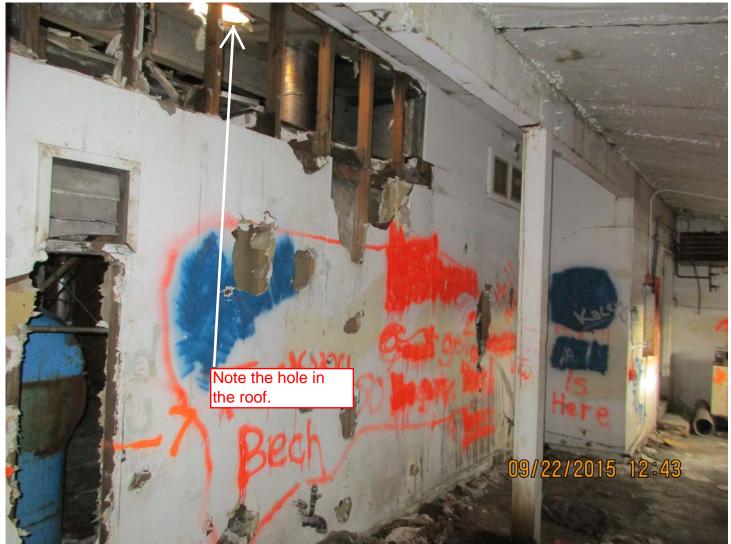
The wall separating the laundry room and mechanical room. Note the hole in the roof above the mechanical room.
